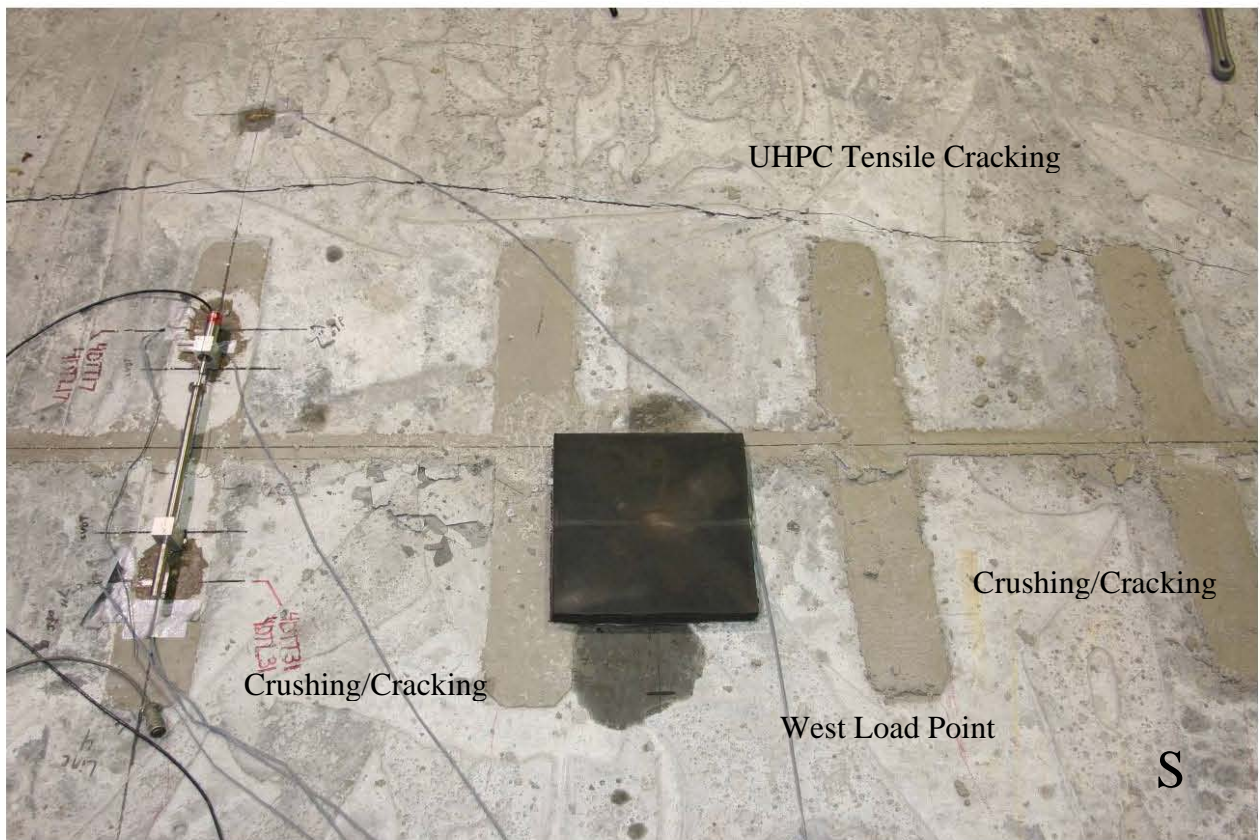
Photo. Distress visible on top of deck after Test T2J.
